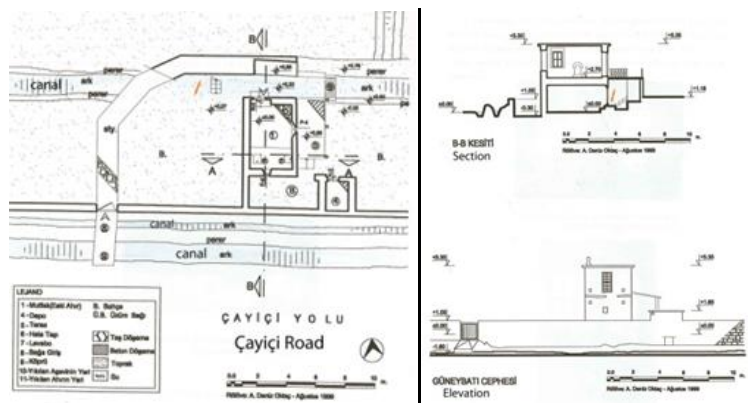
Yanartaş shack sample in Sille Orchards (plan, section and facet) (Author, 2001)
